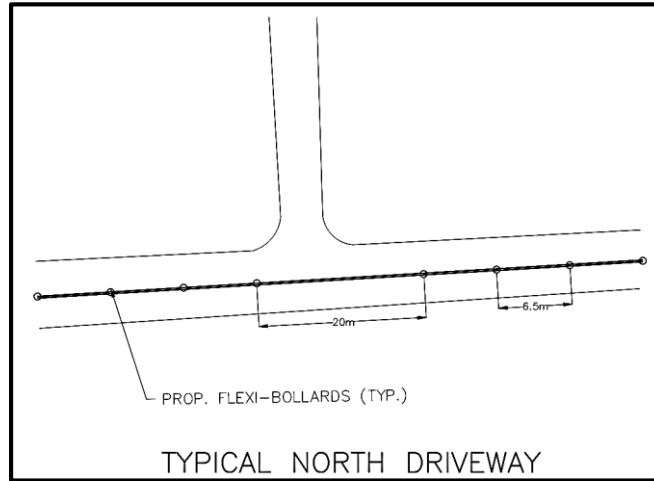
Typical Bollard Layout (North Driveway Entrance)
